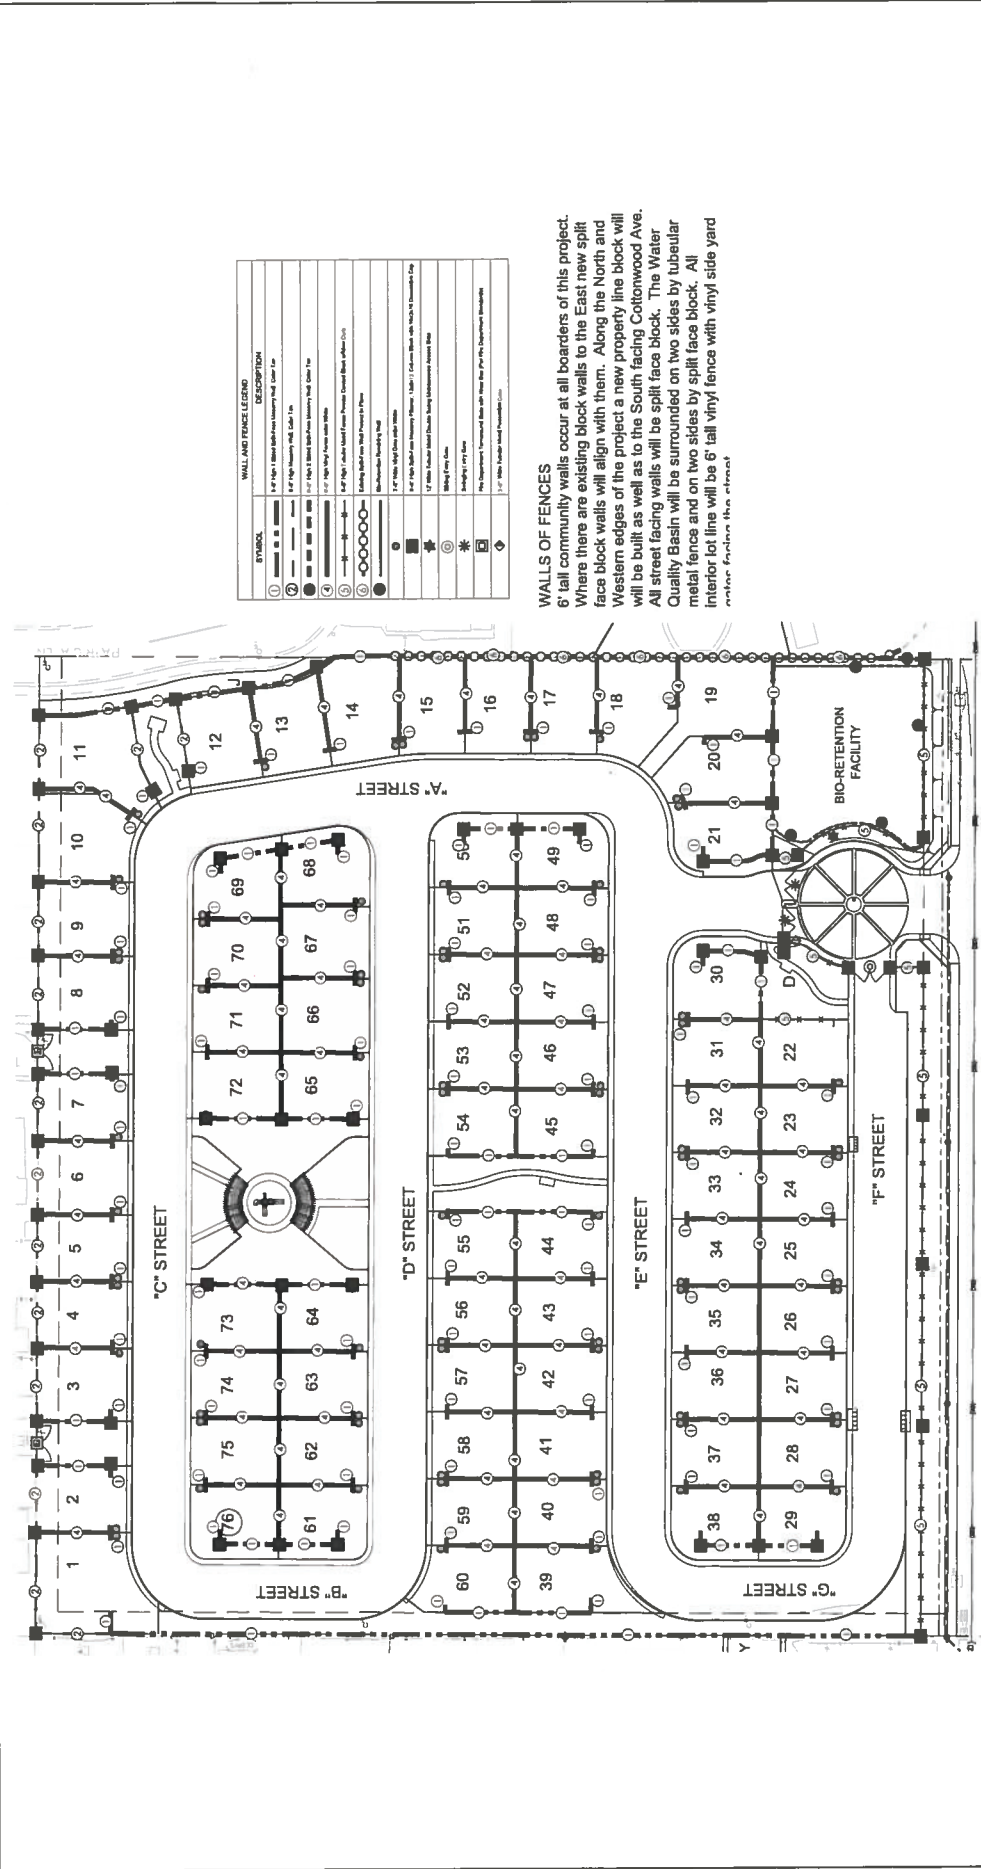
WALL AND FENCE PLAN Page IV.10
